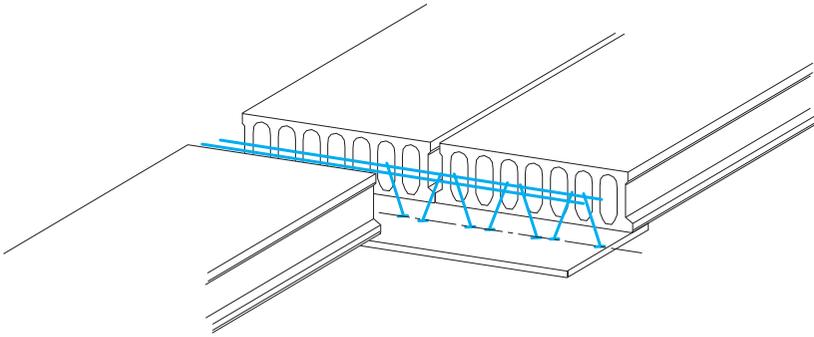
The hollow core floor supported by a reticular steel beam.
